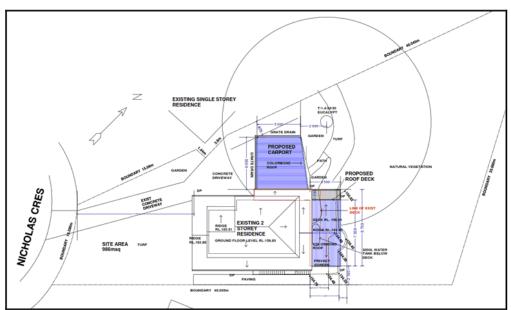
Site Plan, showing location of proposed works with the new deck at the rear of the house
